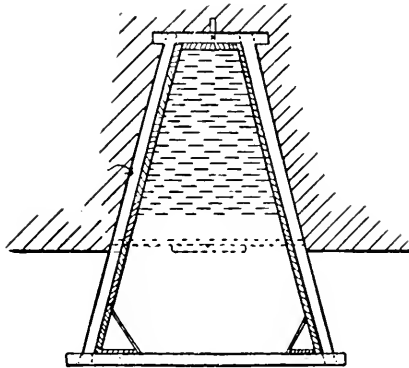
Vertical section of swimming vat, showing end of trap.
